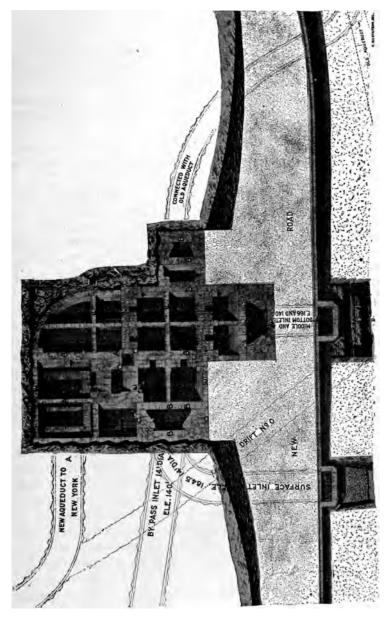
Plan of Inlet Gate-house of New Croton Aqueduct.
